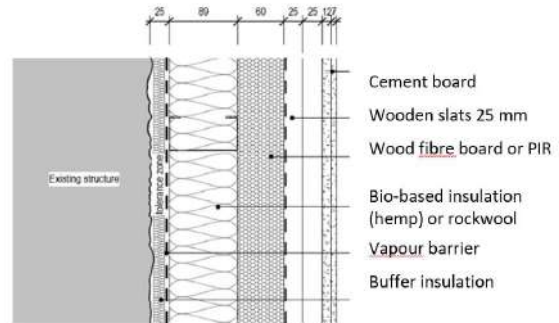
Cross-section of façade insulation element – Design Proposal (Coady Architects).
